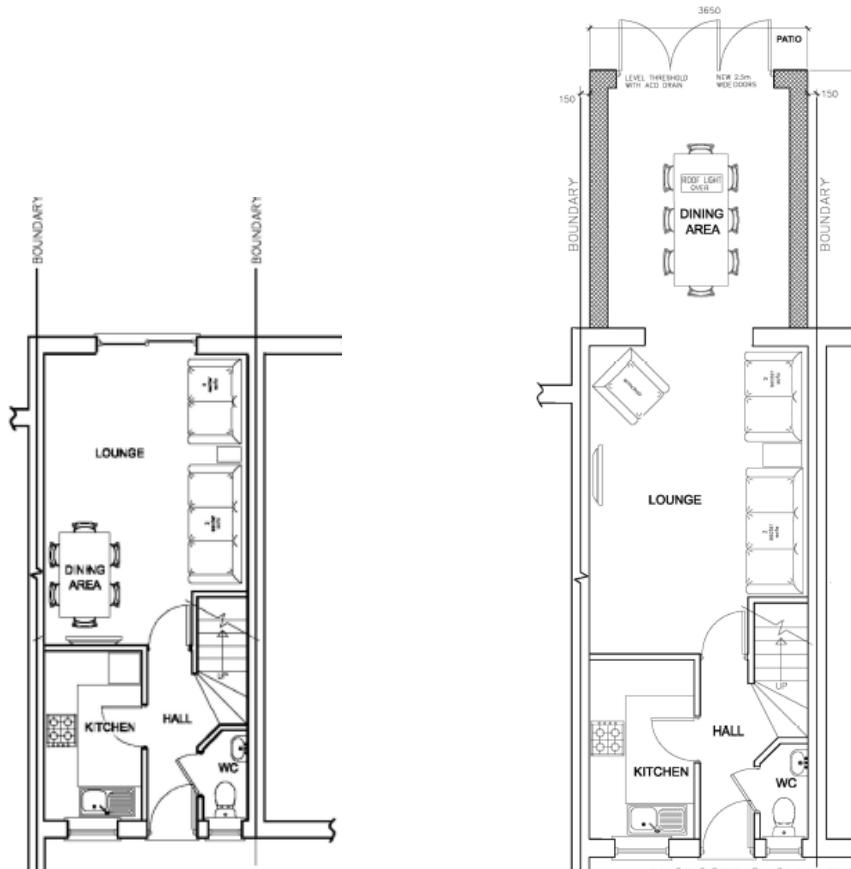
Existing floor plan (left) and proposed floor plan (right)
